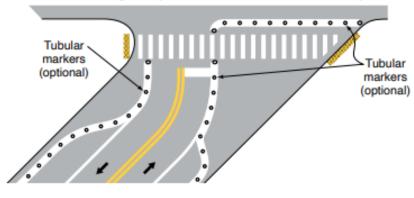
J-6. Examples of Sidewalk Extensions Designated by Pavement Markings and Channelization
